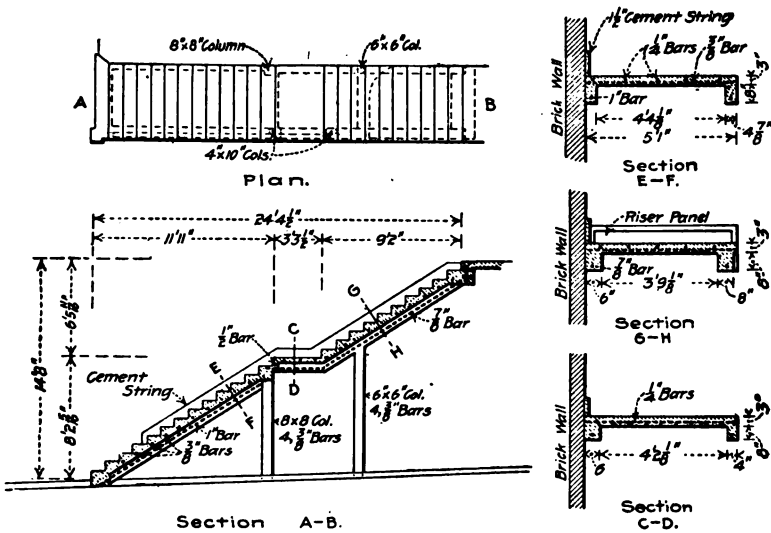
Narrow Stairway Construction, New York Rapid Transit R.R.
